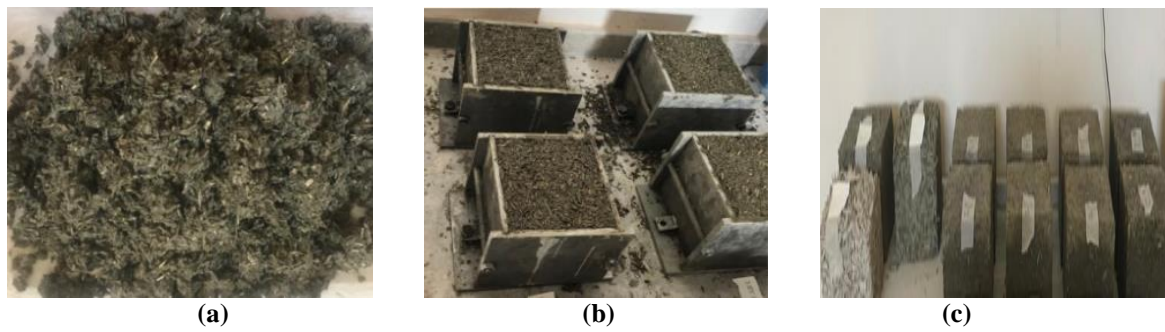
(a) Mixing, (b) Molding & (c) Drying of Hempcrete
